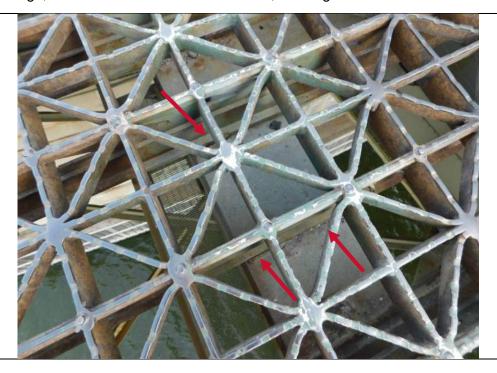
[Span 5] -Detail view of grid deck with broken weld connecting lower main bar to stringer top flange, South leaf in SB lanes near Pier 4, Looking North
